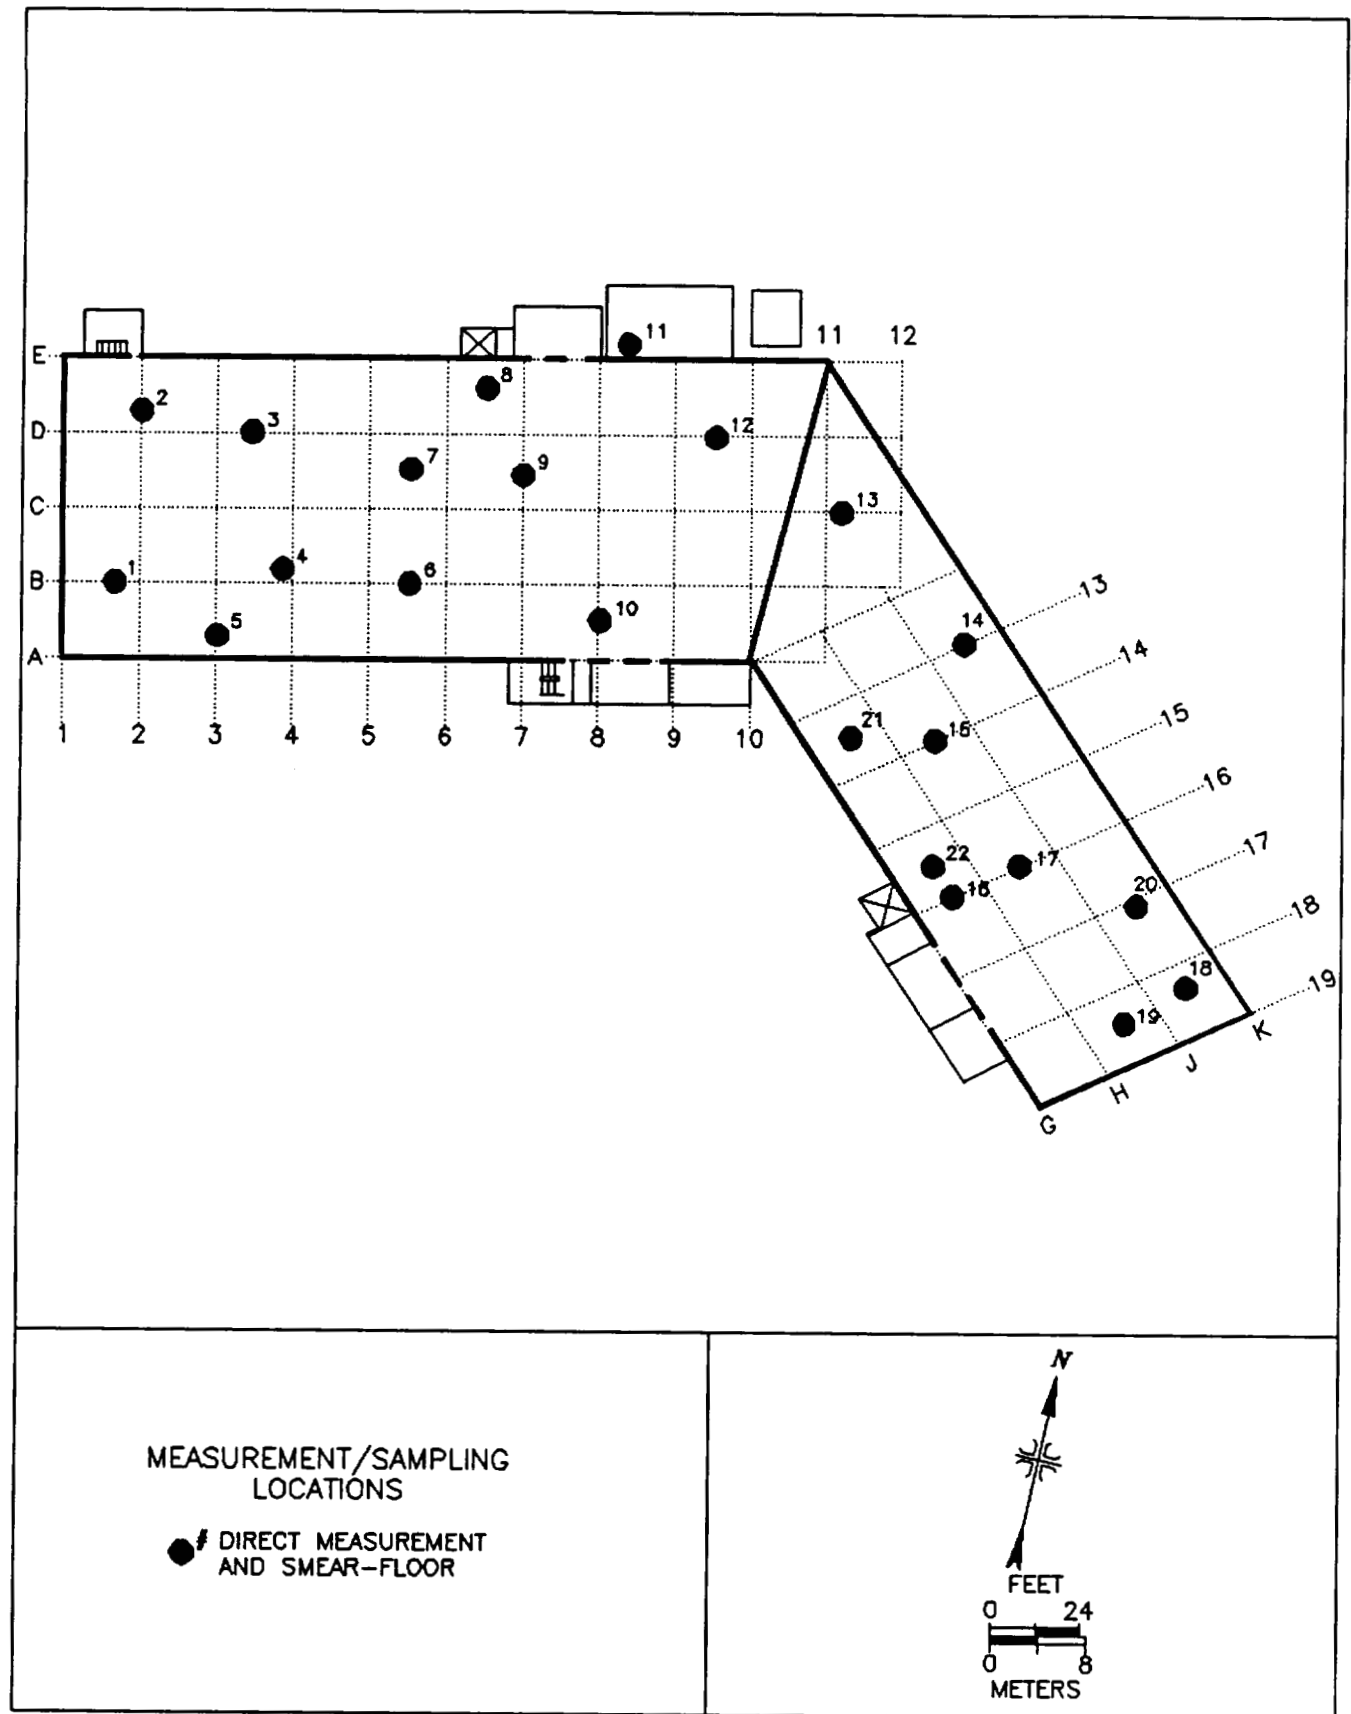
Building 8, Second Floor – Measurement and Sampling Locations
